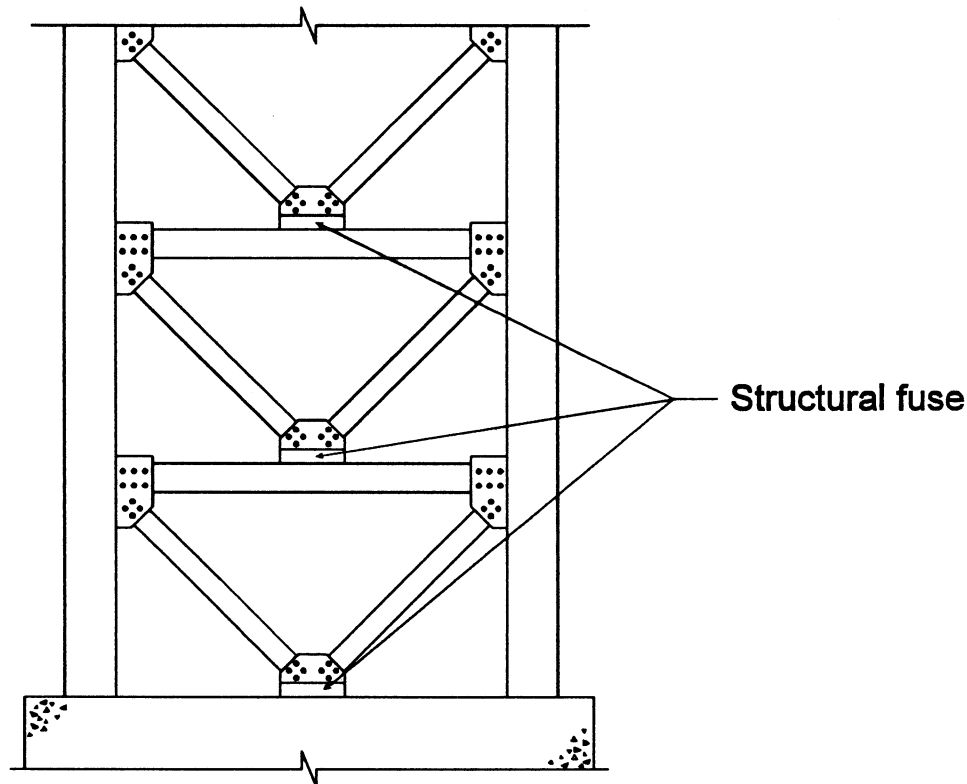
Concentric bracing with structural "fuse" at connection
